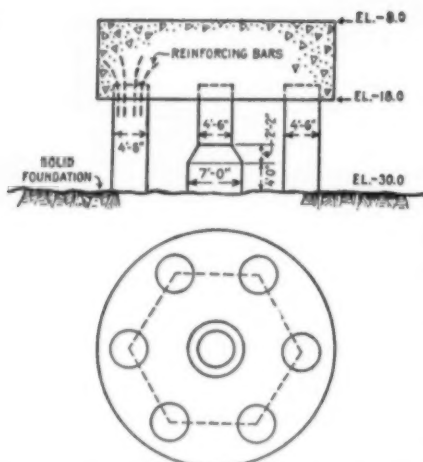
Redesign of Pier for Swing Span Over Coquille River Necessitated by Encountering Solid Foundation at Elevation -30.0. This Design Covers Considerably More Than the First Design in Which It Was Anticipated That Piles Could Be Driven
